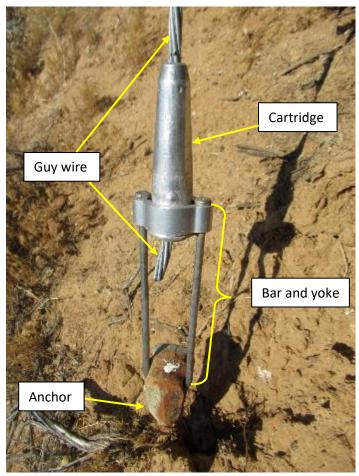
Like-for-like replacement of failed automatic dead end assembly at pole 4389254E.
